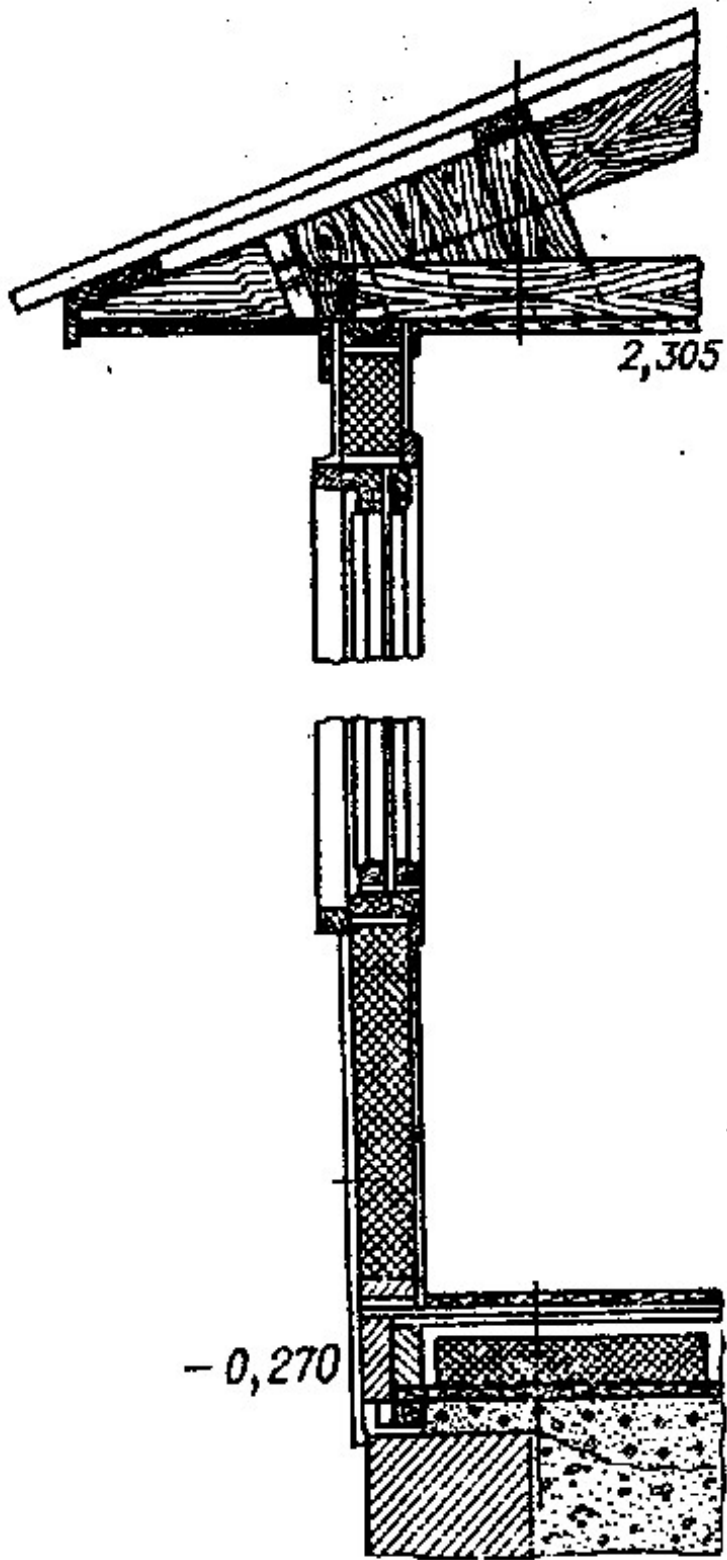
Critical Structural Details - Vertical Sections Through the Wall
